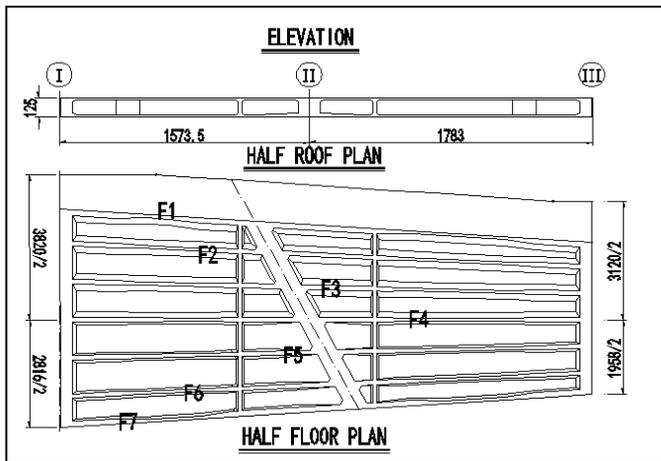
FIGURE IV. THE DIAGRAMMATIC SKETCH OF WIDENING BOX GIRDER (UNIT: CM)
